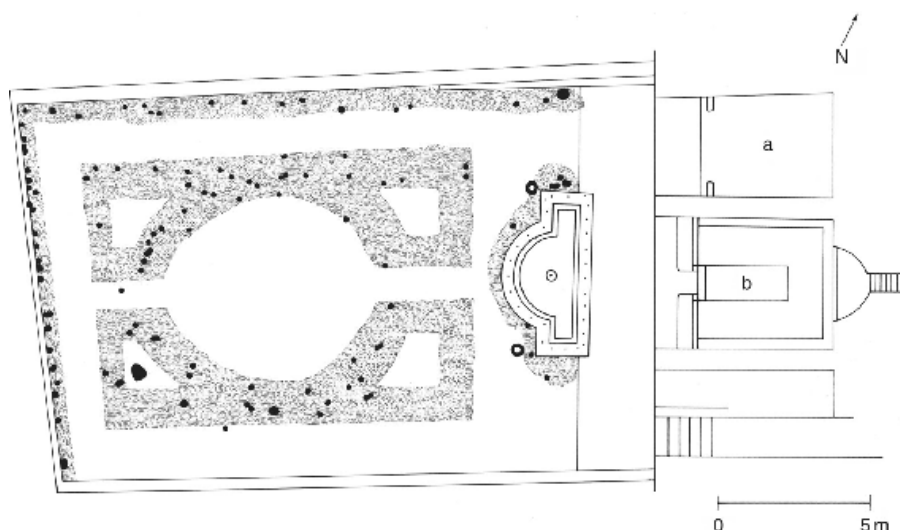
Plan of the garden level and adjacent dining rooms, Pompeii,
